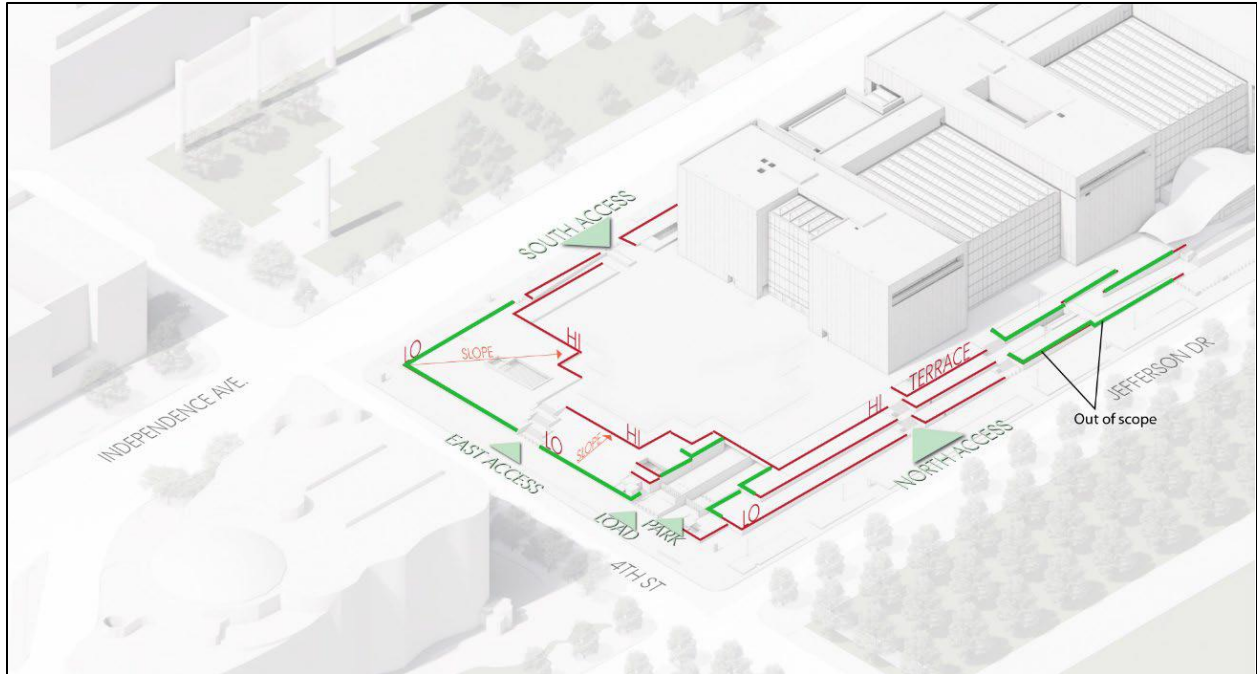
DIAGRAM OF THE CURRENT RETAINING WALLS, TIERED TERRACES, AND PLANTING BEDS AT THE EAST END OF THE NASM.
